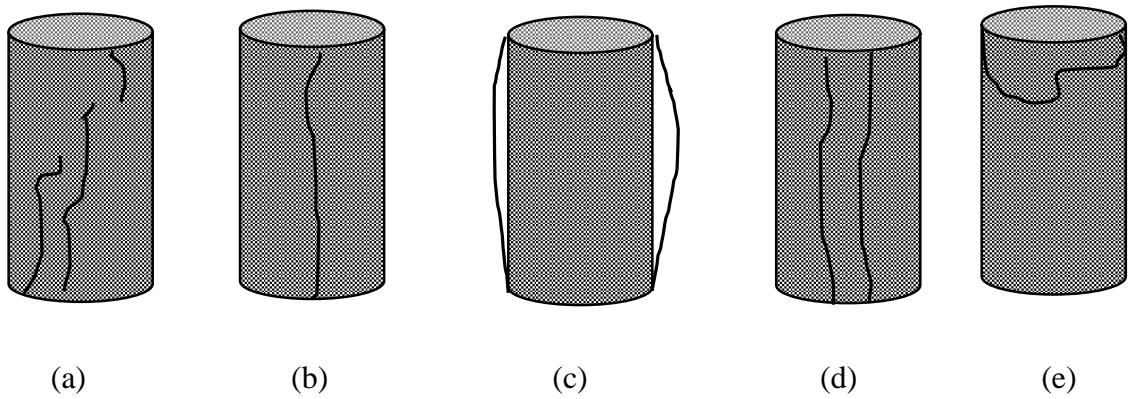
Failure patterns of grouted samples: (a) shear failure, (b) axial split, (c) bulging (d) collapse, (e) column mode failure
